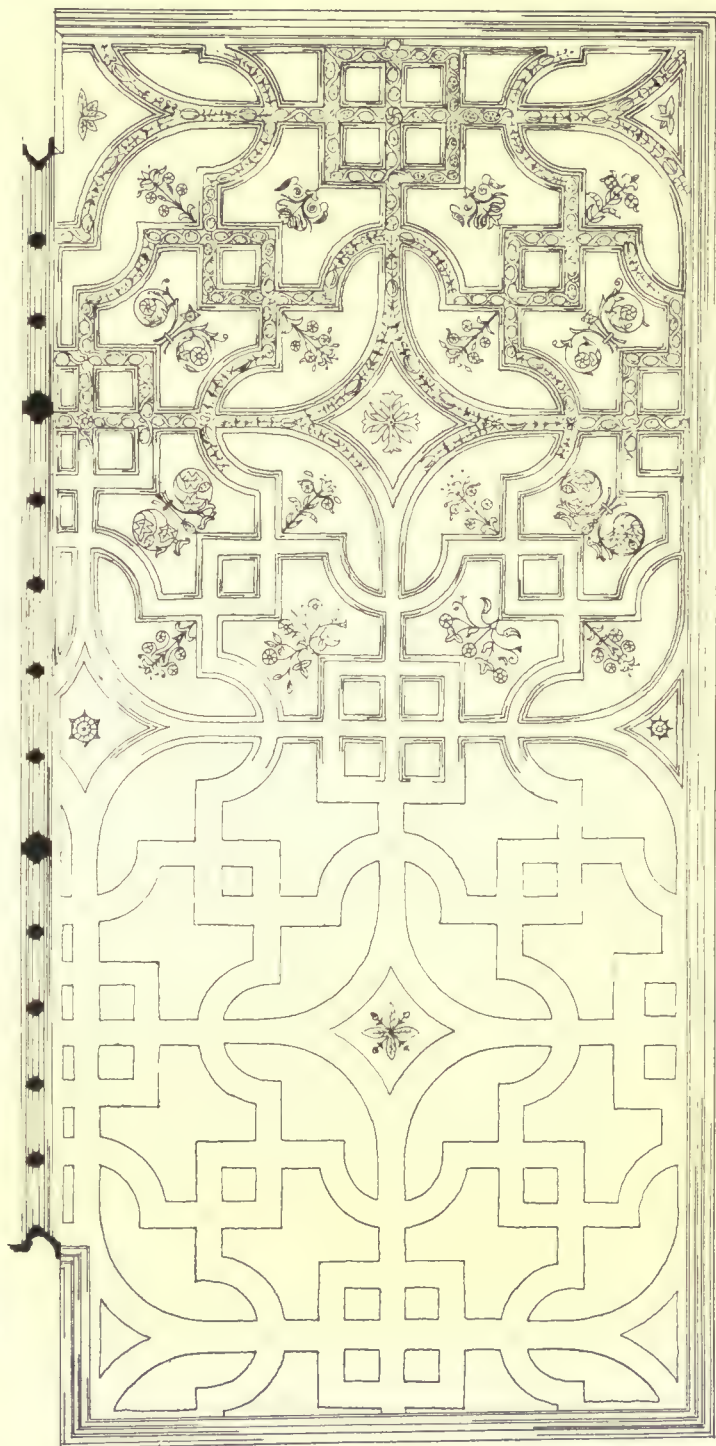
Plan of Drawing-room Ceiling, Hatfield House.
